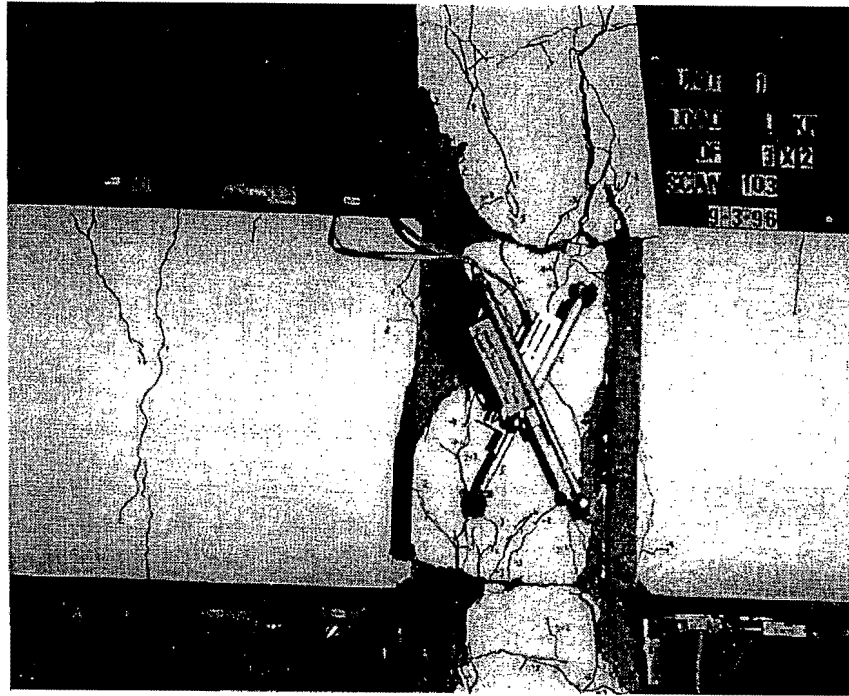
Final Appearance of As-Built Interior Beam-Column Joint Unit 1
